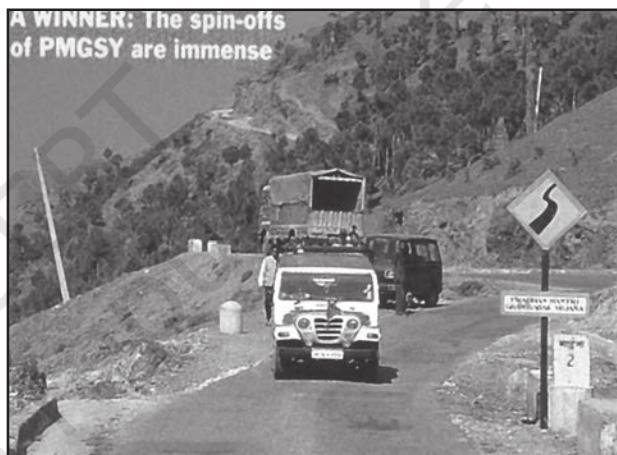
Road constructed under the Pradhan Mantri Gram Sadak Yojna
